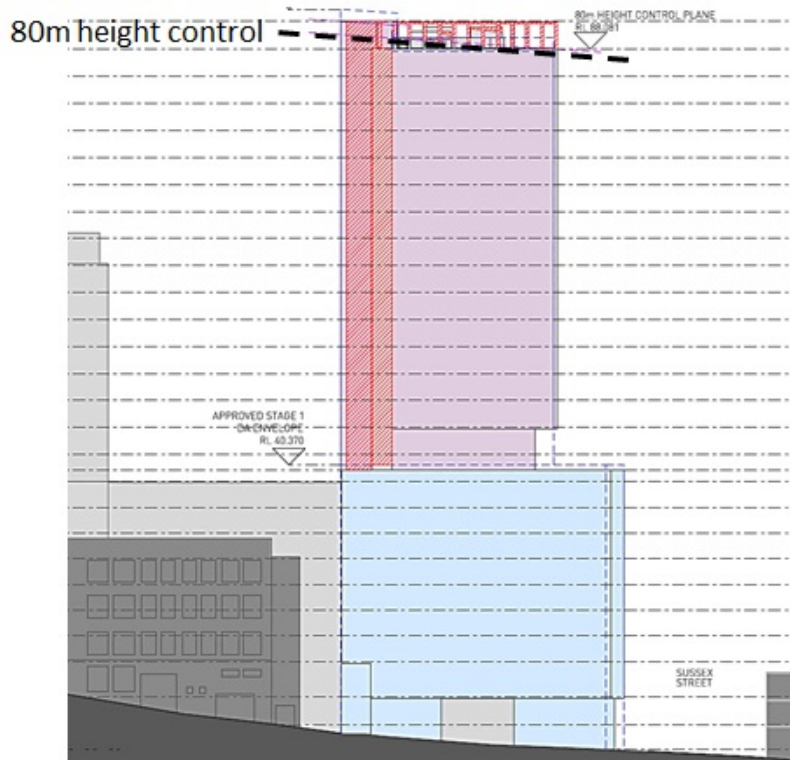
Northern (Druitt Lane) elevation of proposed modifications to approved Stage 1 envelope.
